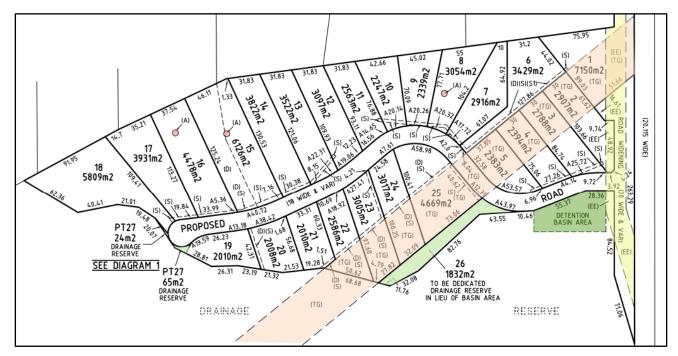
Excerpt Proposed Subdivision Plan prepared by Jabek Pty Ltd
